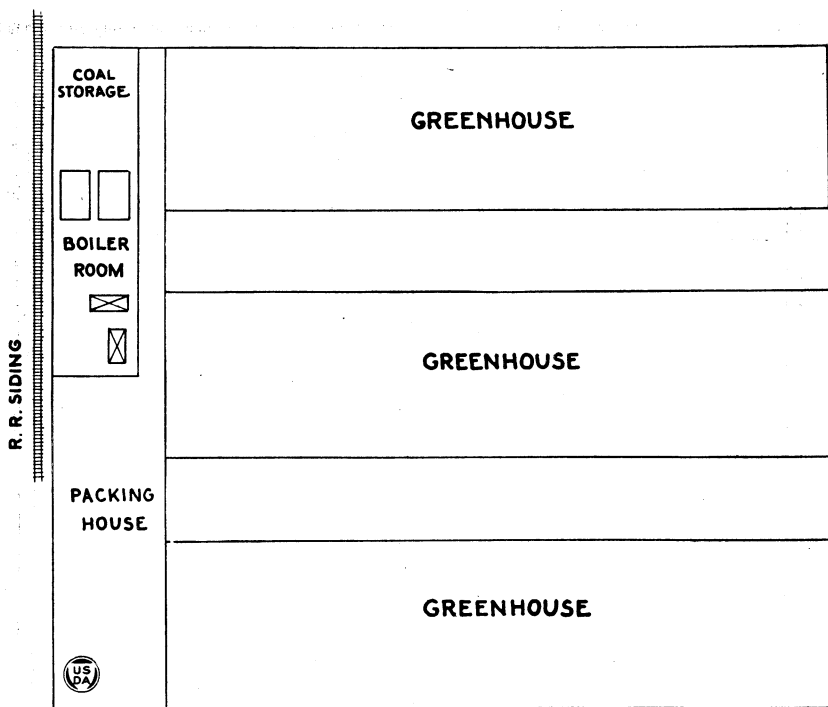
Detached greenhouses with head house across one end, a plan often employed in building ranges of such houses. This arrangement facilitates the economical handling of the work.
